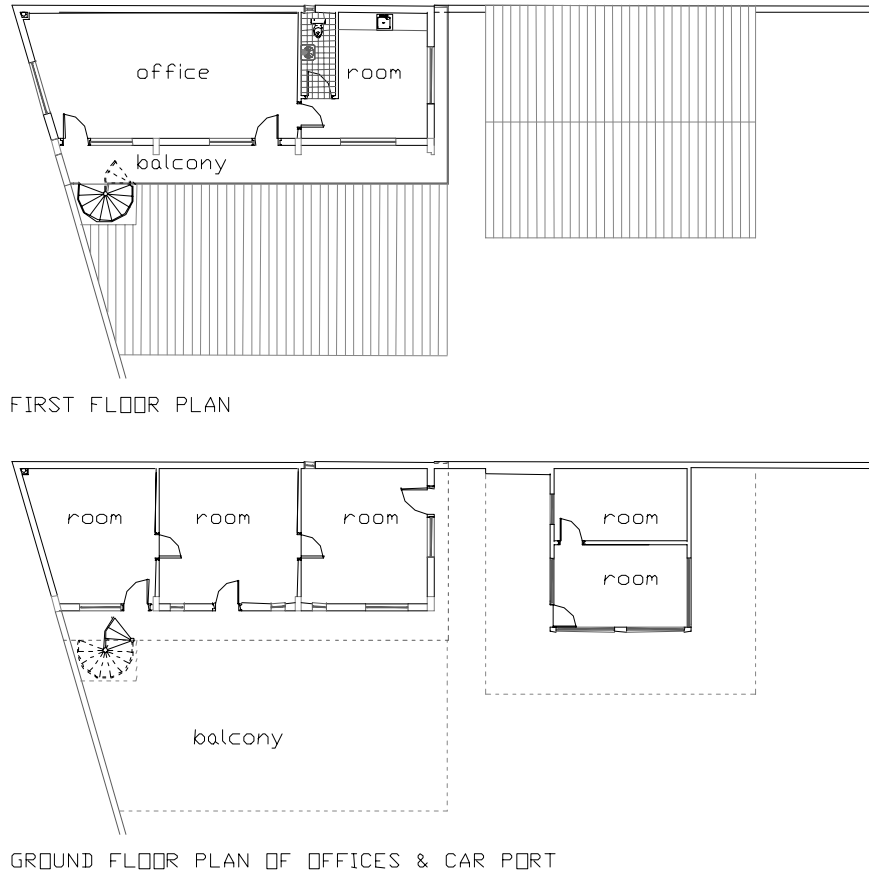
Floor plans of the office buildings in a demolition contractor's yard in Buca, near Izmir.
